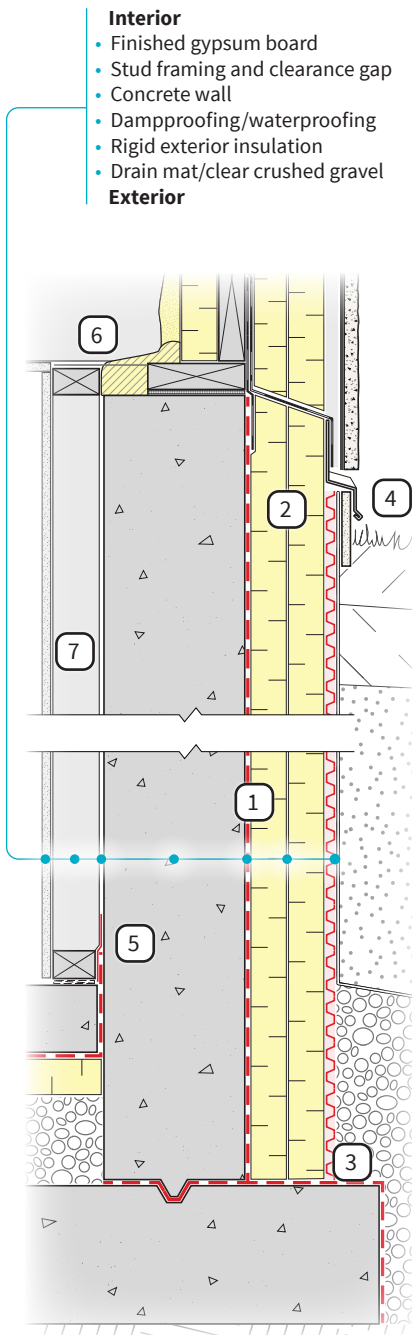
"Best practice": exterior-insulated foundation wall.
